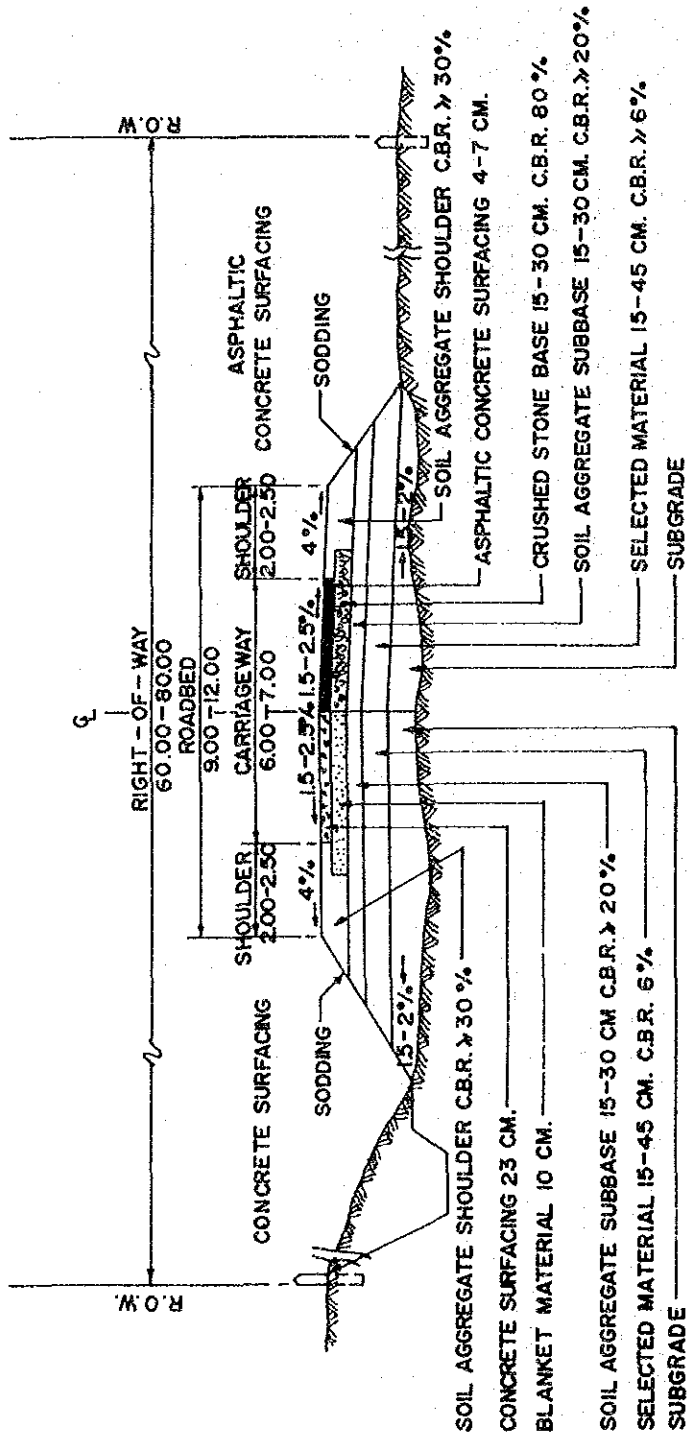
TYPICAL CROSS SECTION OF PRIMARY HIGHWAY
